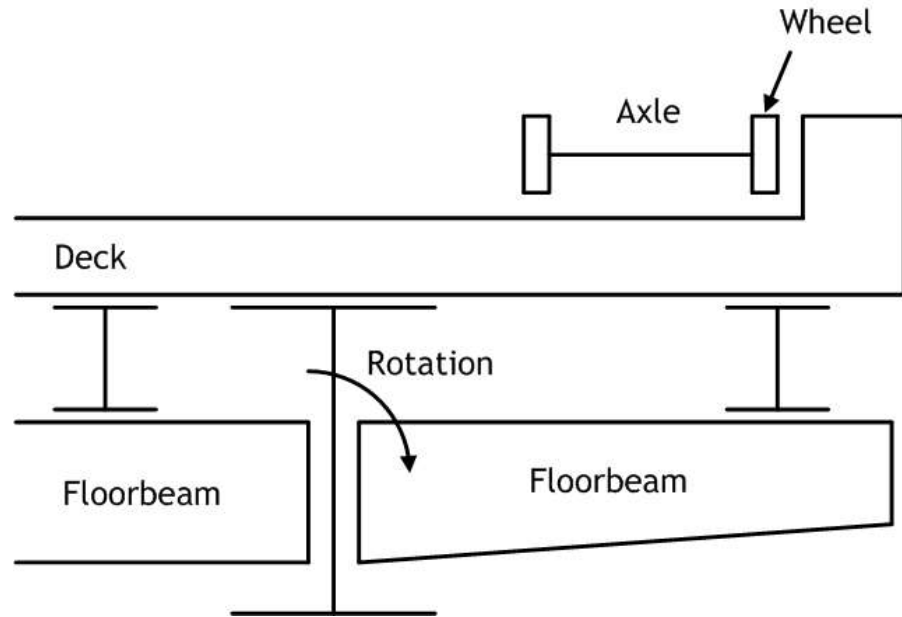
Cantilevered Floorbeam Producing Out-of-Plane Bending due to Differential Deflection of Stringer
